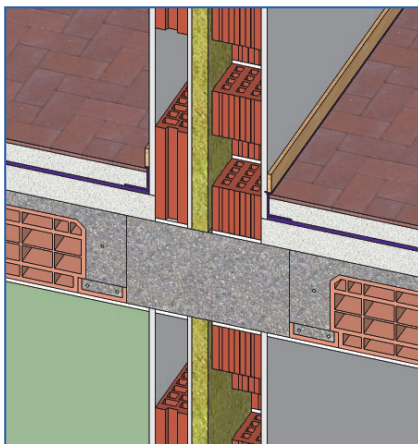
Building with continuous floor slabs and a masonry cavity separating wall. [[2] - (Italy)].
